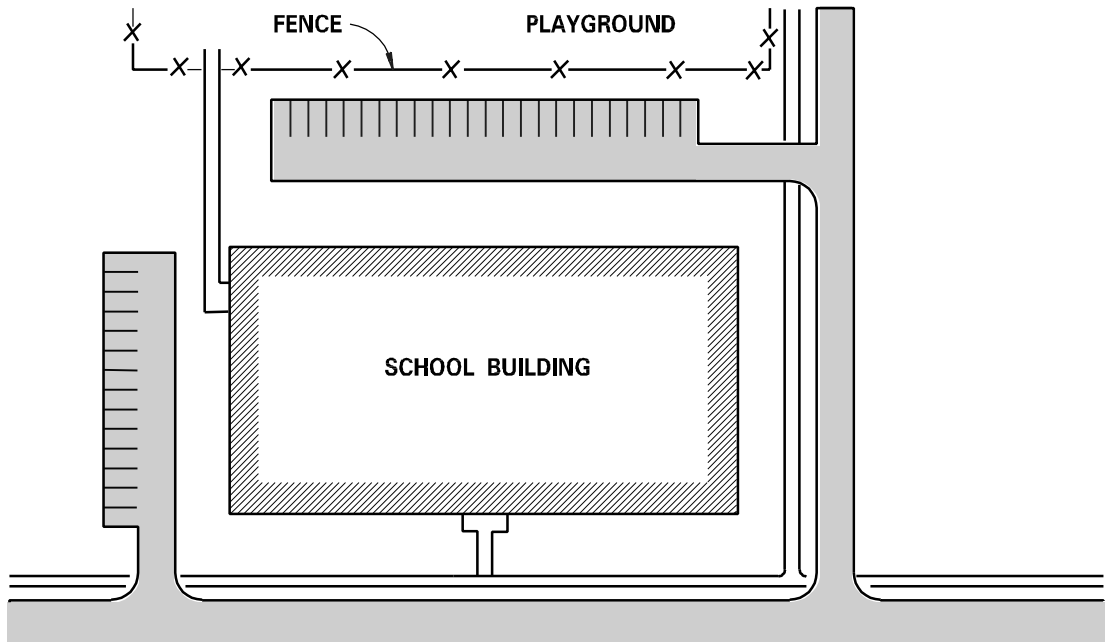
shows where sidewalks have been provided for safe walkways and bikeways along the streets; the driveway is interrupted, the playground is fenced, and a walkway is provided from the school to the playground. This may be done rather inexpensively and provides a far greater measure of safety for the students.
